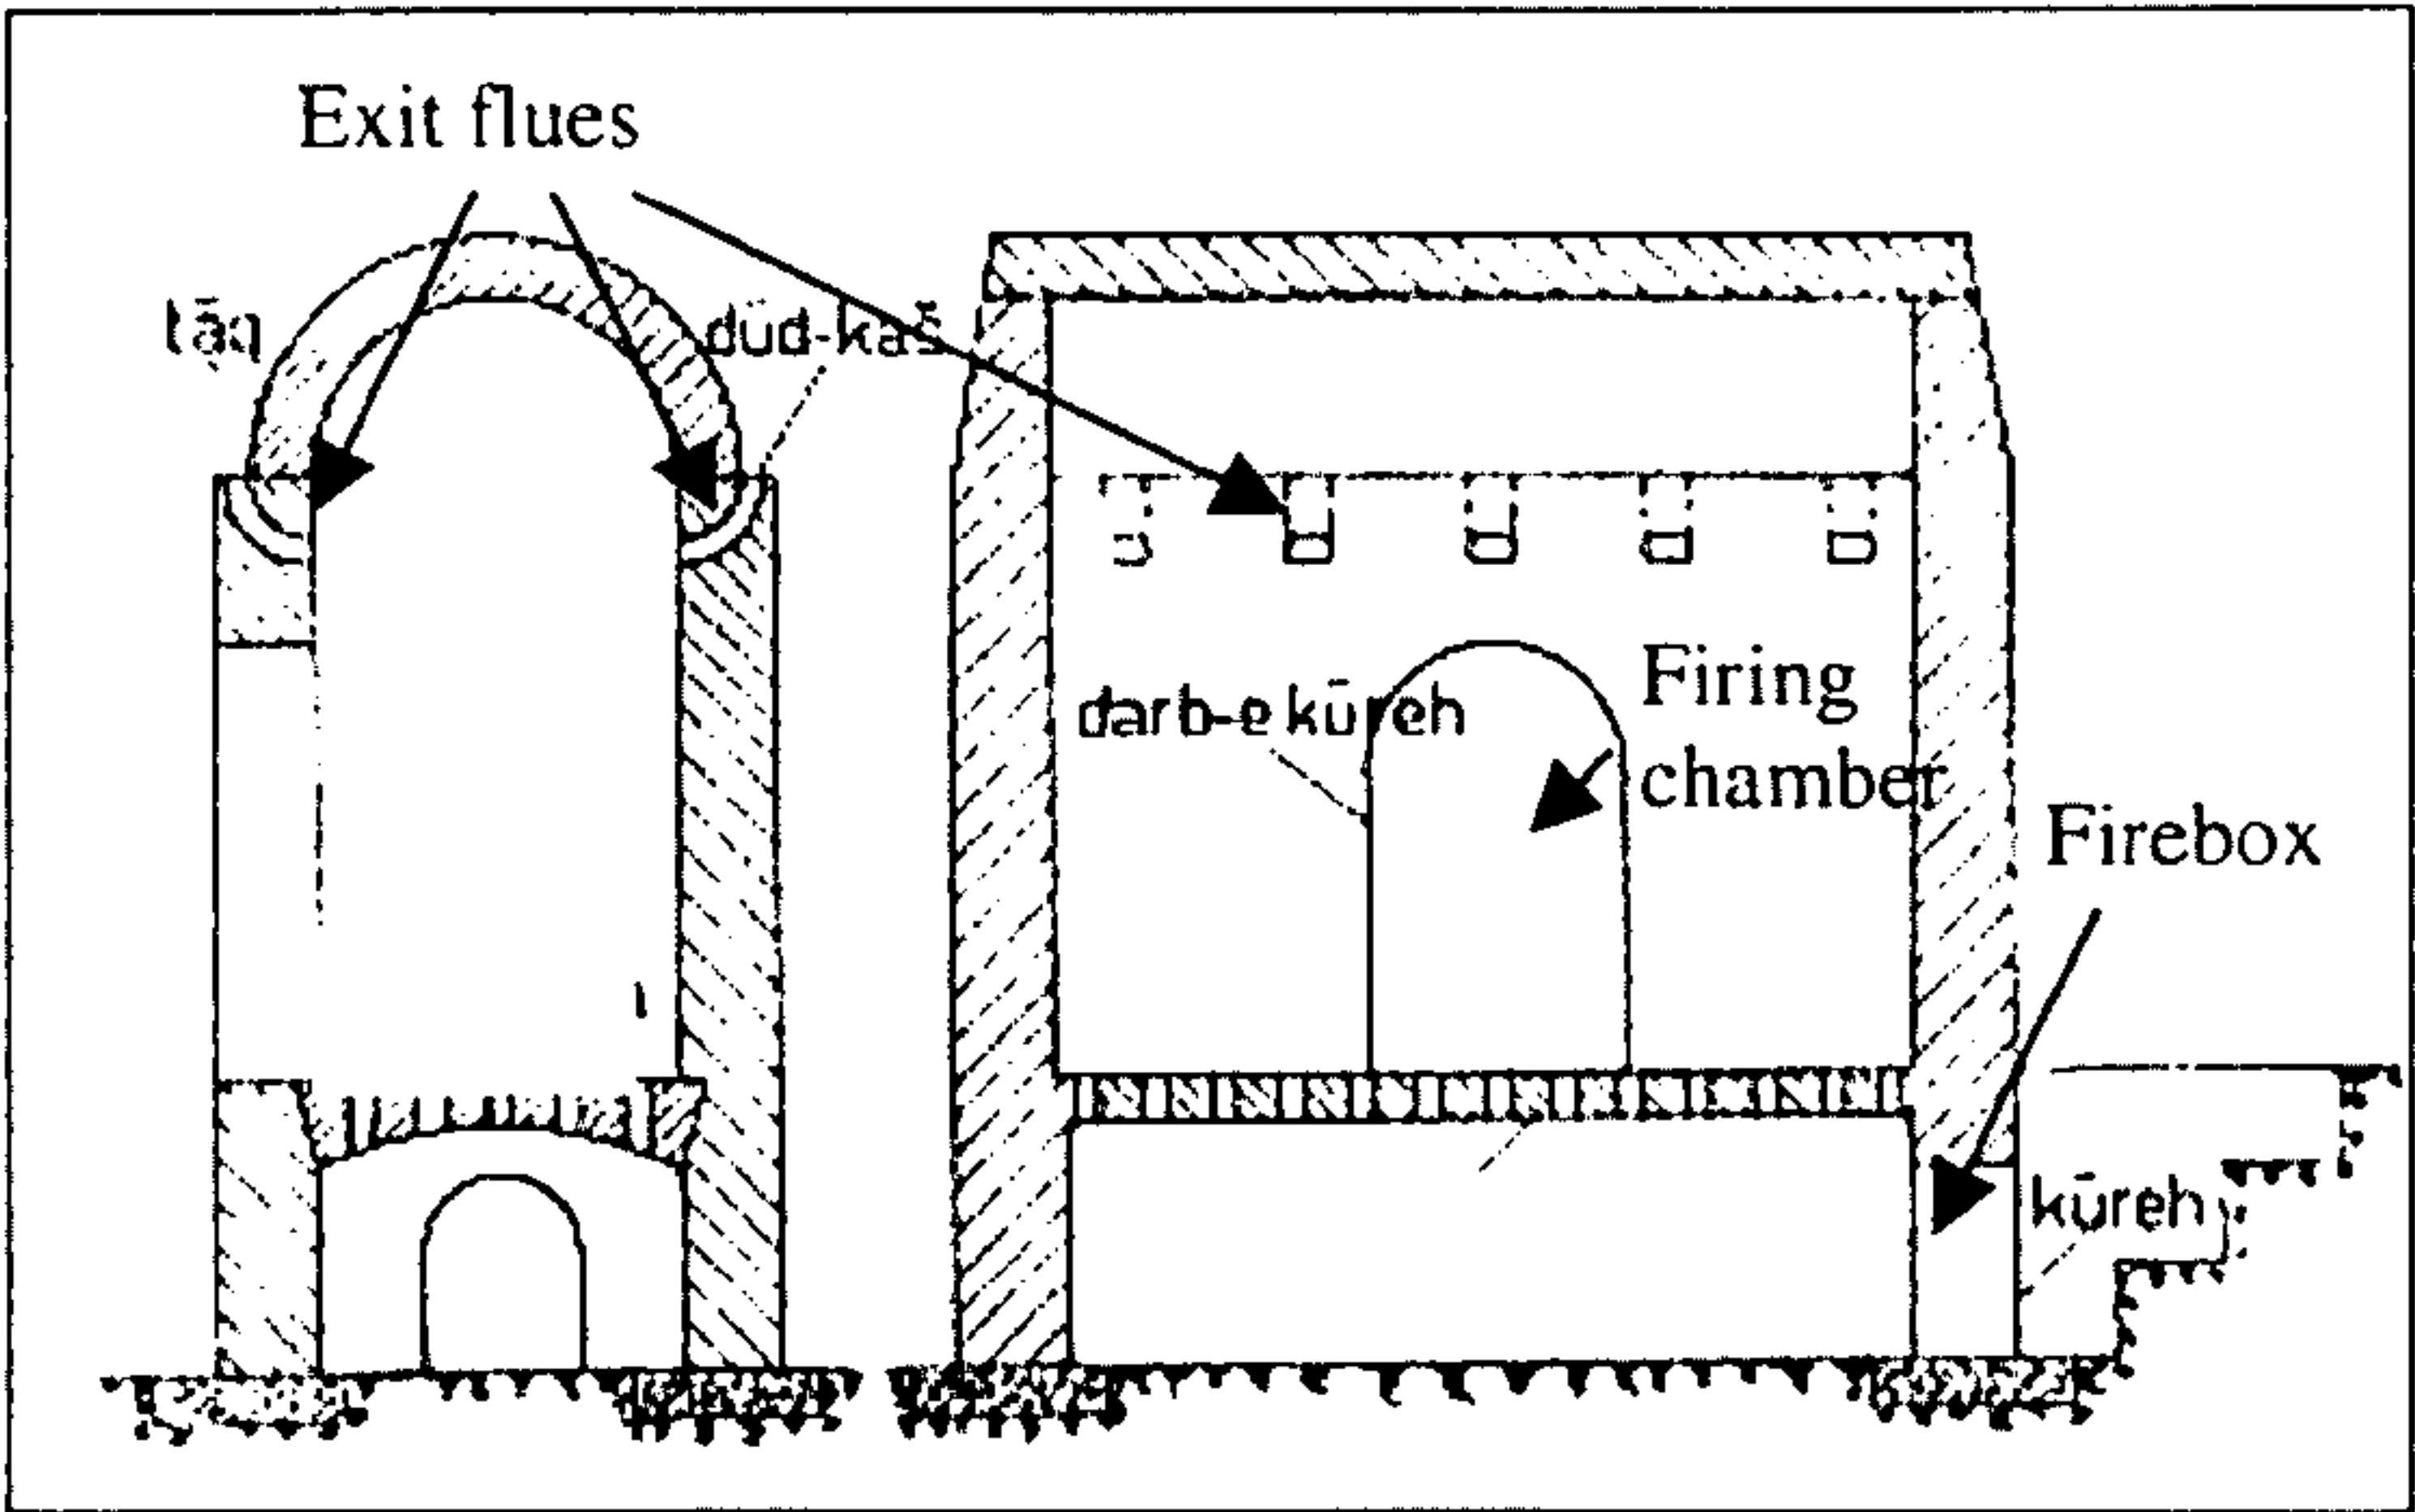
A pottery kiln with side domed roof and side exit flues (from Wulff, 1966, 159).
